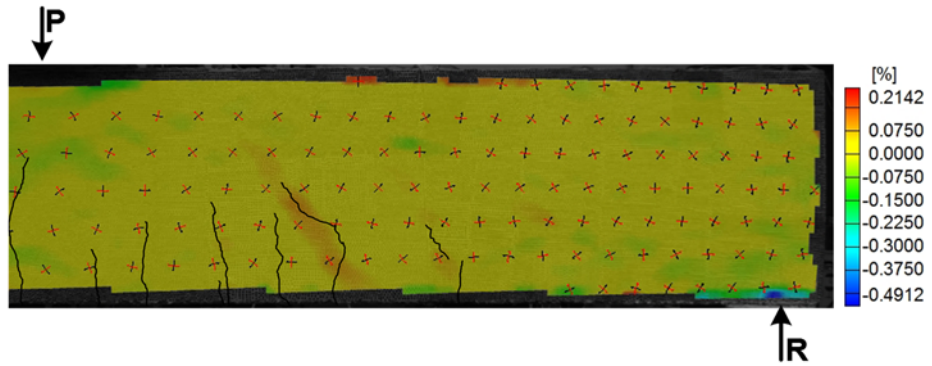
Full-field concrete transverse strain ( $\epsilon_y$ ) across shear span for specimen RC18b at load 35 kips
